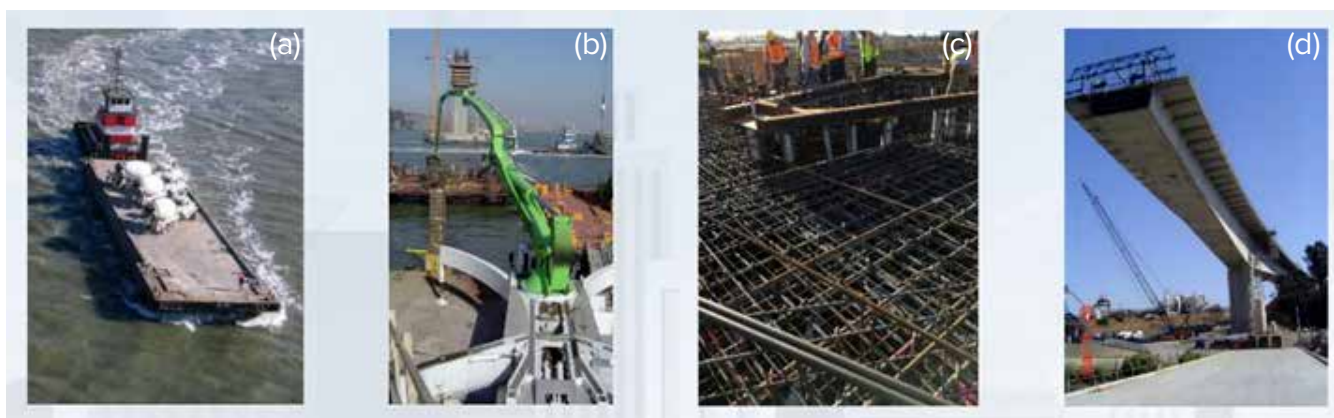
Complex construction operations require compatible specifications: (a) concrete batches that will be transported by barge will require extended working times; (b) underwater concrete placements will require concrete mixtures with anti-washout properties; (c) large foundation elements will require concrete mixtures with low heat of hydration and are suitable for acceptance based on concrete strength at 56 days; and (d) segmented precast concrete for bridges will require formwork and mixtures that satisfy aesthetic demands and durability requirements. (Images courtesy of Kiewit Corporation.)
